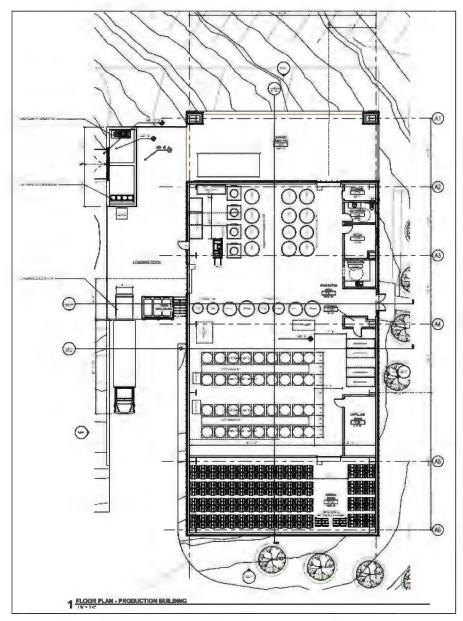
Proposed Site Plan for Kutch Winery (See Attachment 1)
